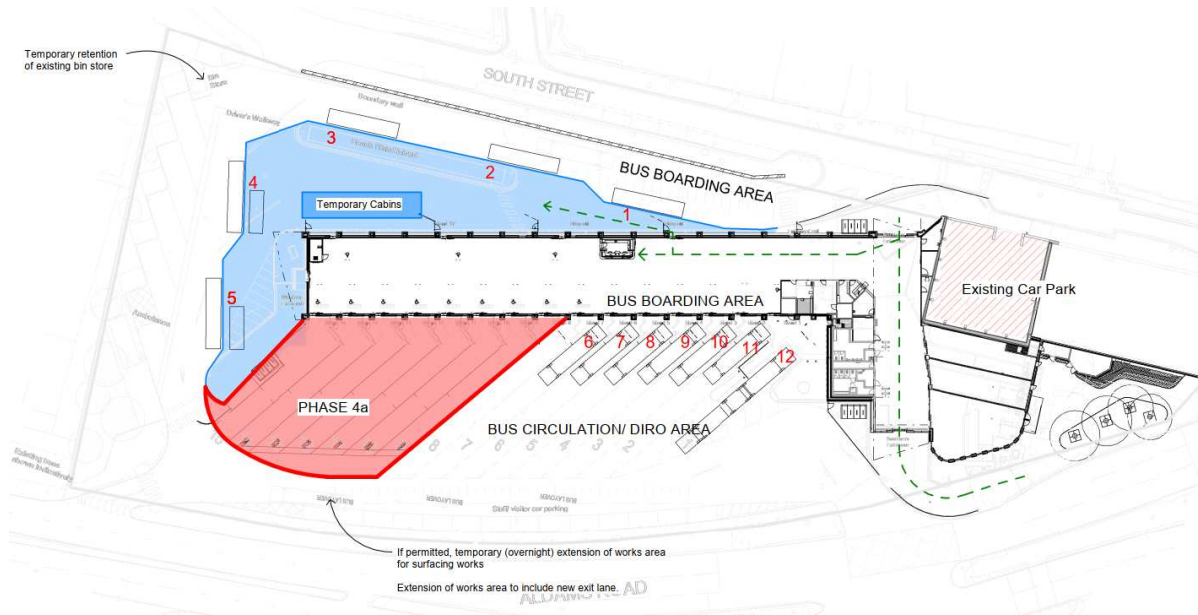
Phase 4a Plan – External Works to DIRO Bays
